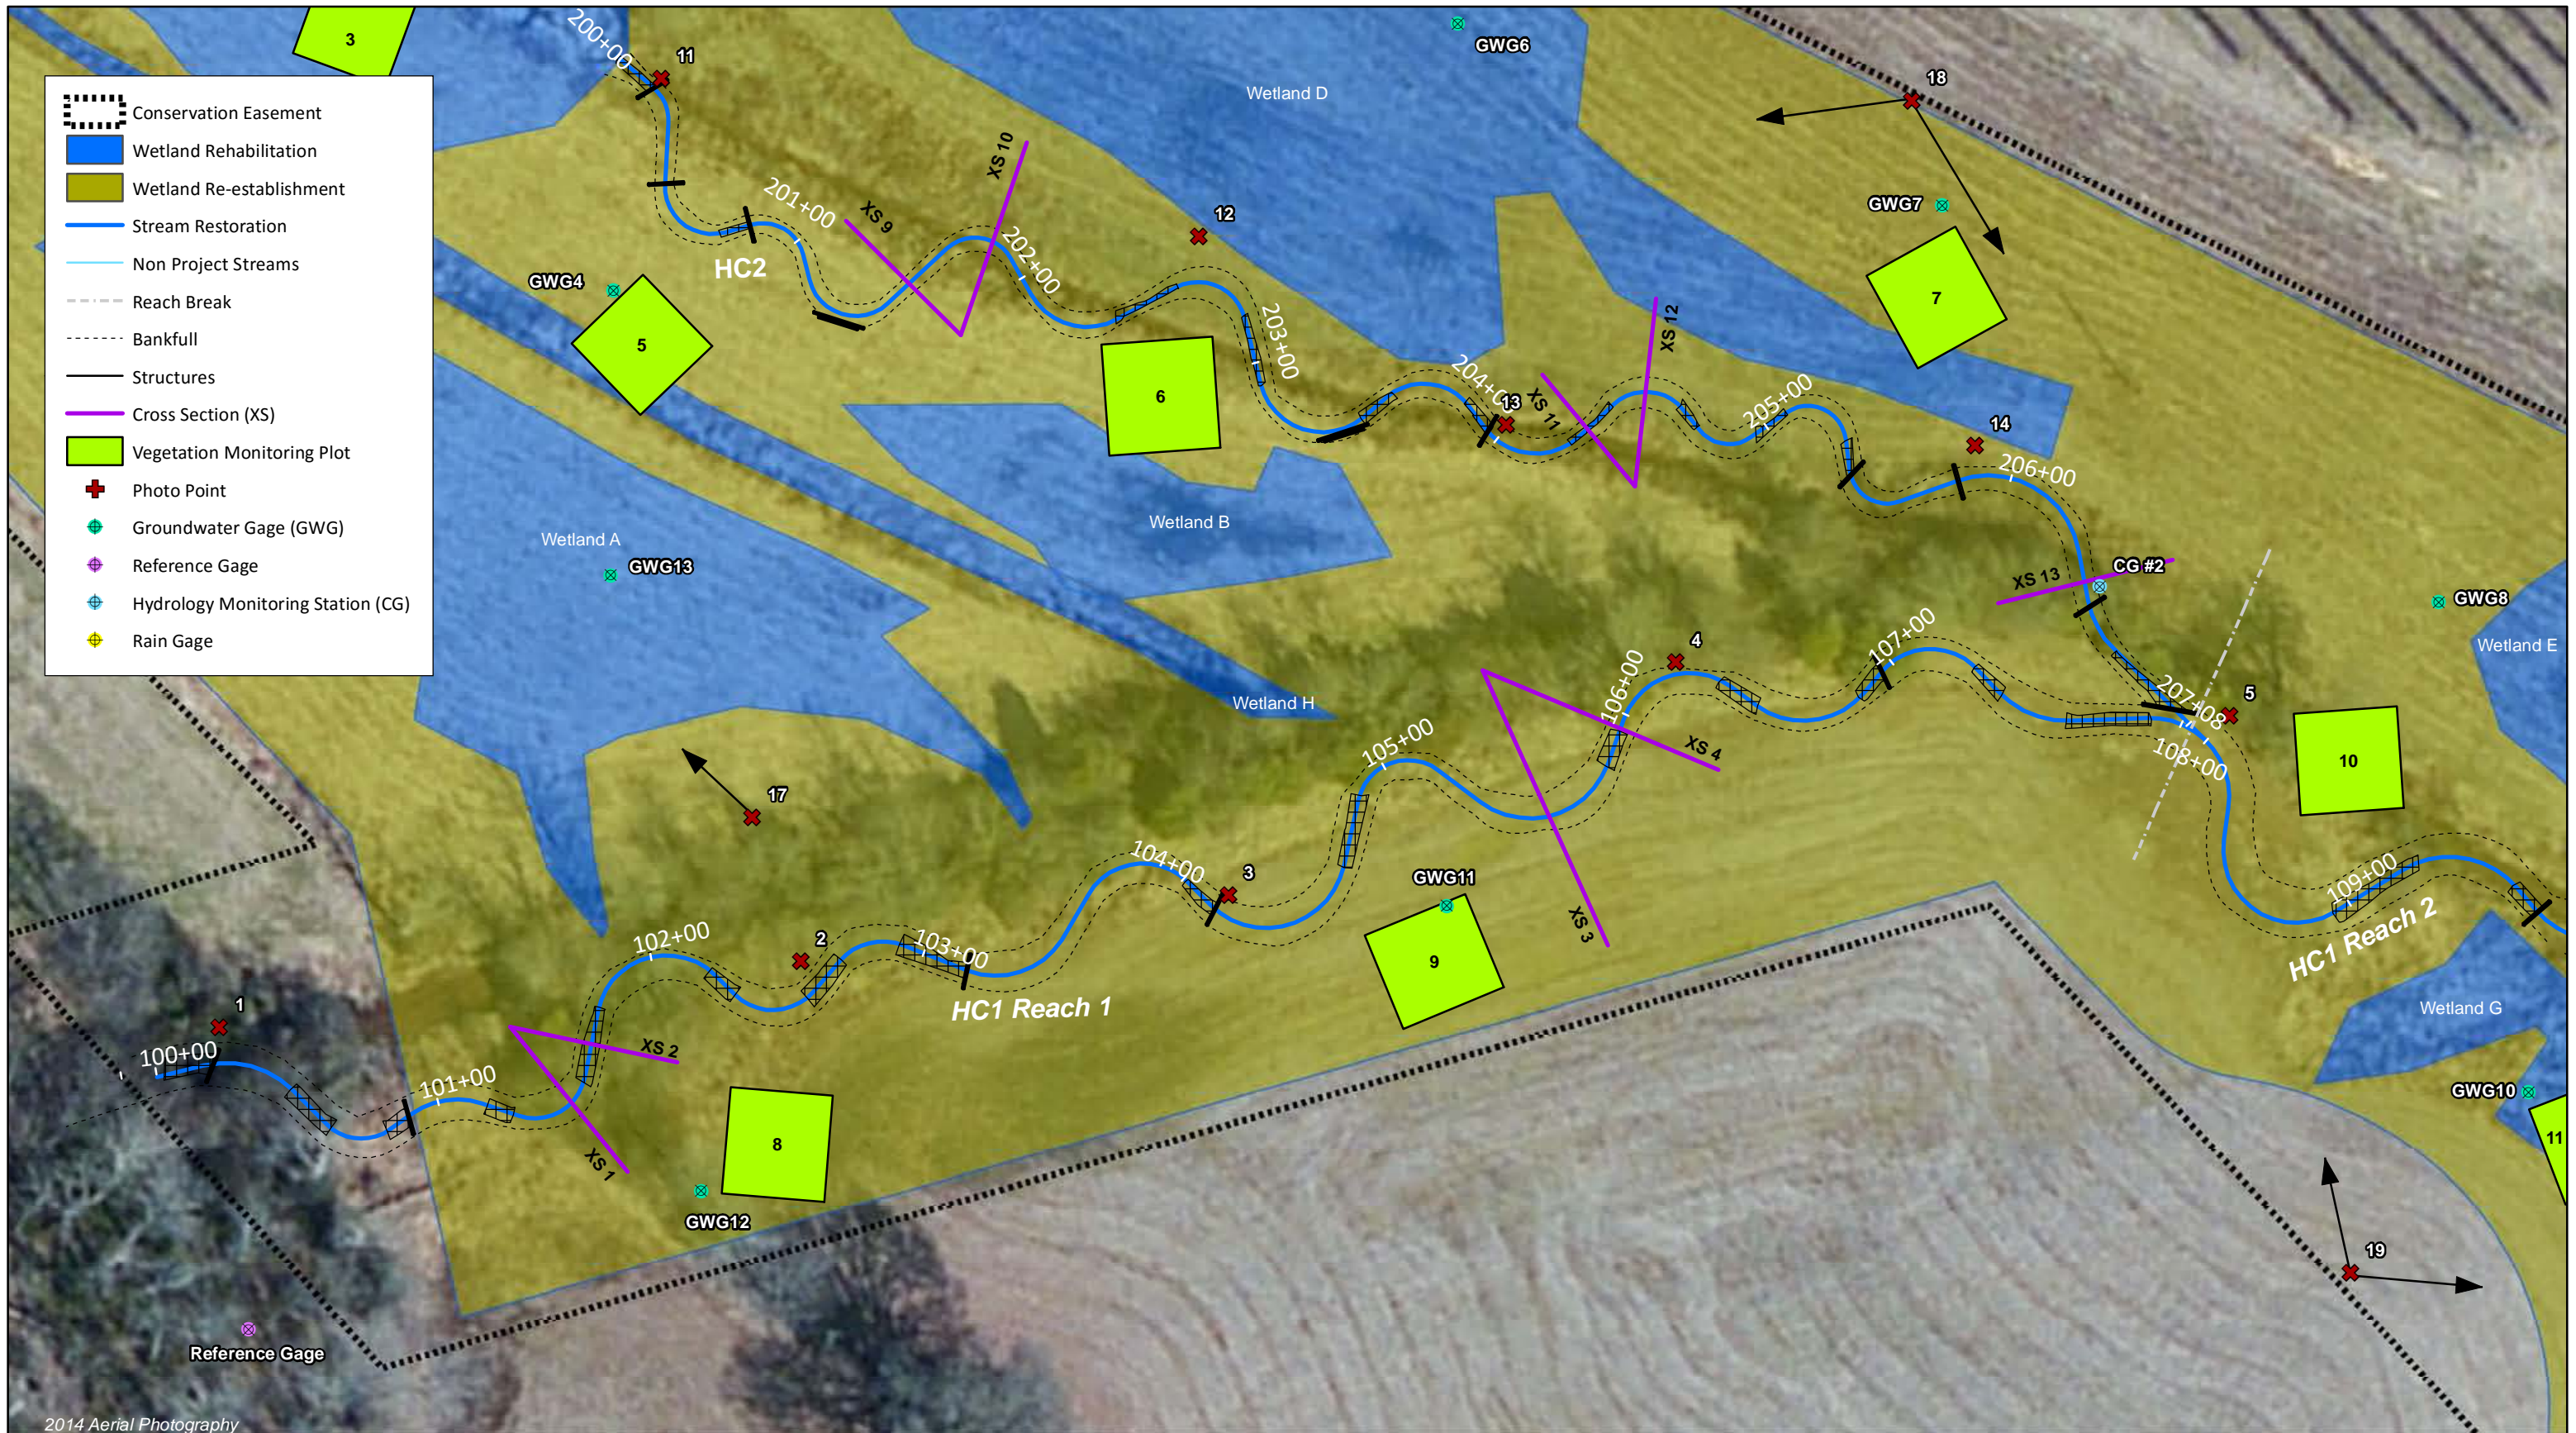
Monitoring Plan View (Sheet 1 of 3)
